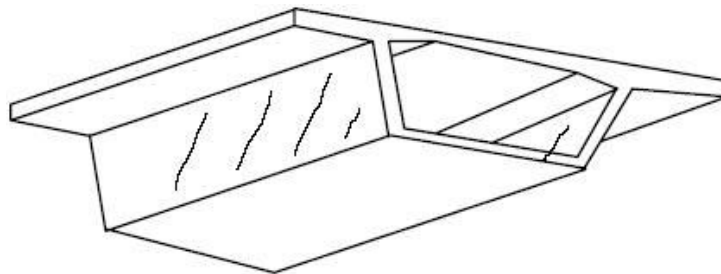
Box Girder Cracks Induced by Shear
